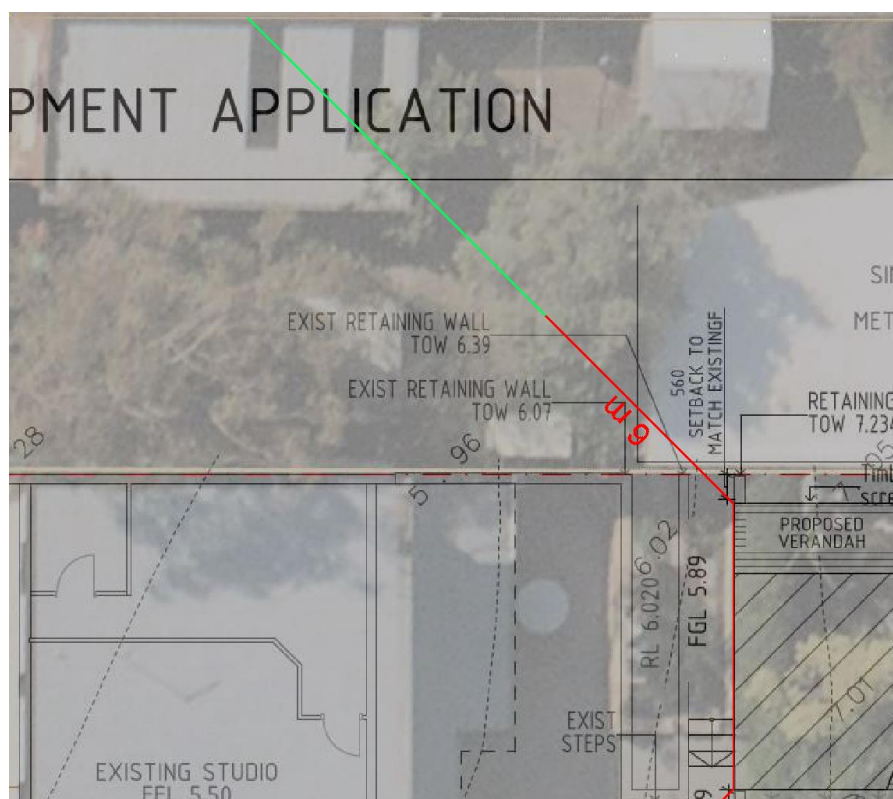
Area of northern neighbour overlooked by upper floor Kitchen/Living Room facing north.
